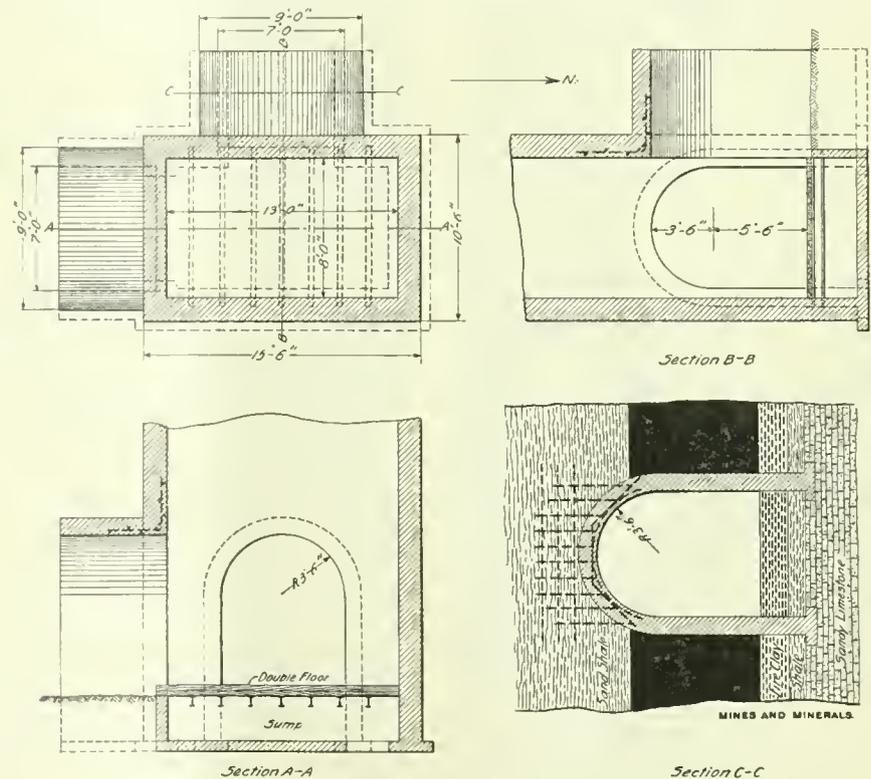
CONSTRUCTION AT SHAFT BOTTOM
